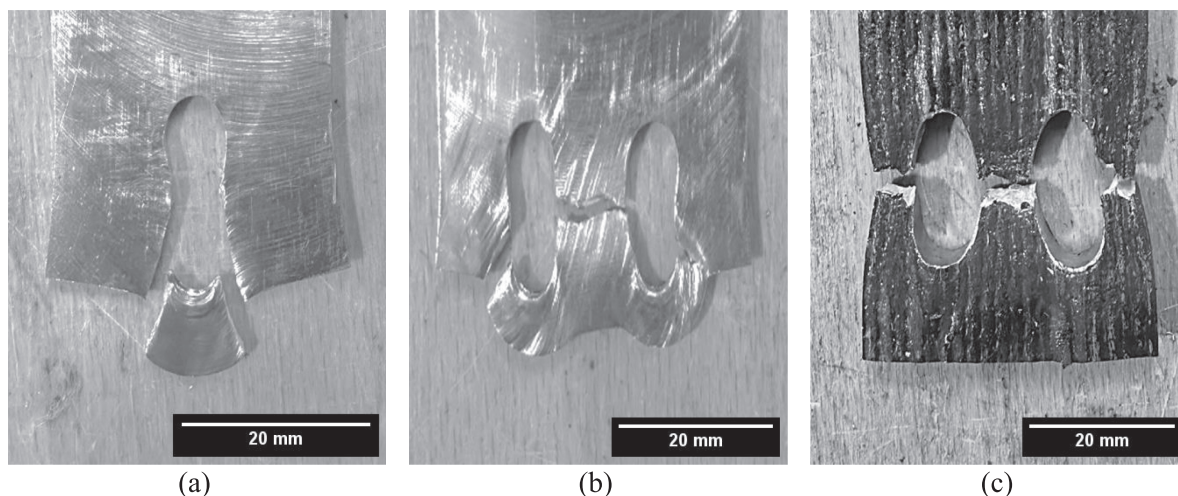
| Representative governing failure modes observed in double-bolted configuration plates: (a) and (b) correspond to WAAM machined plates exhibiting SO and BT failures, respectively; (c) shows a WAAM as-built plate with NST failure [19].
